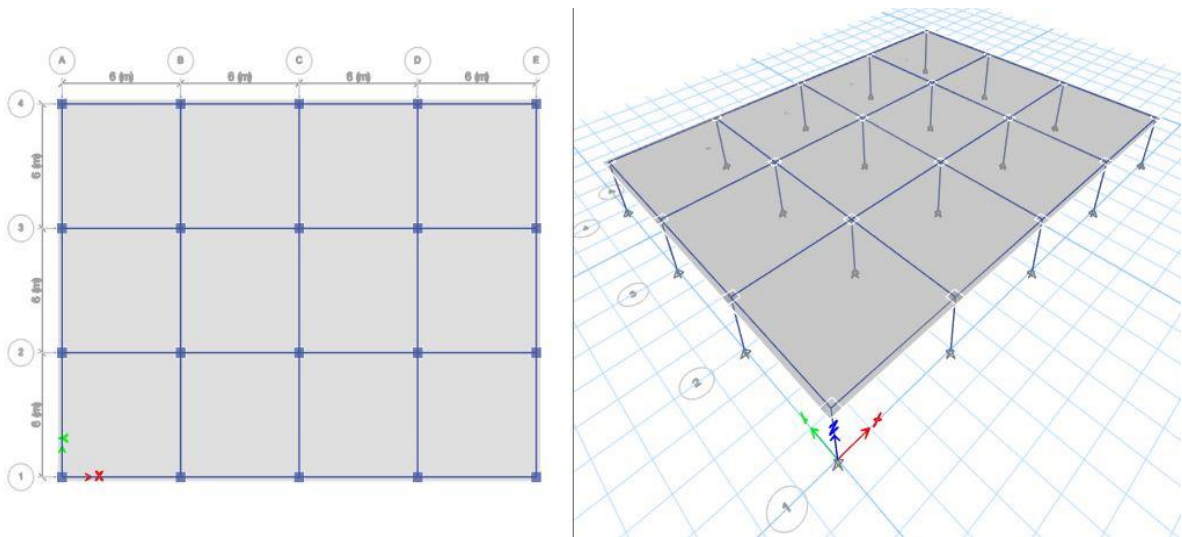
The Dimension and The Layout of The One-Story Structure Building.
